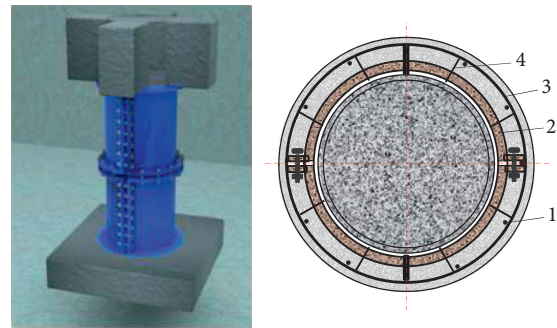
Schematic diagram of the reinforcement method. (1) Longitudinal bar; (2) semicircular steel plate; (3) stirrup; (4) radial structural bars.
